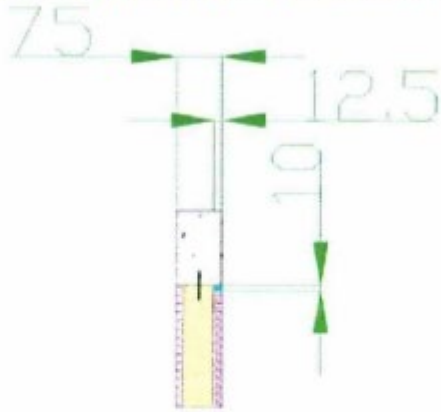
wall gypsum to stone thickness ≥ 75 mm
